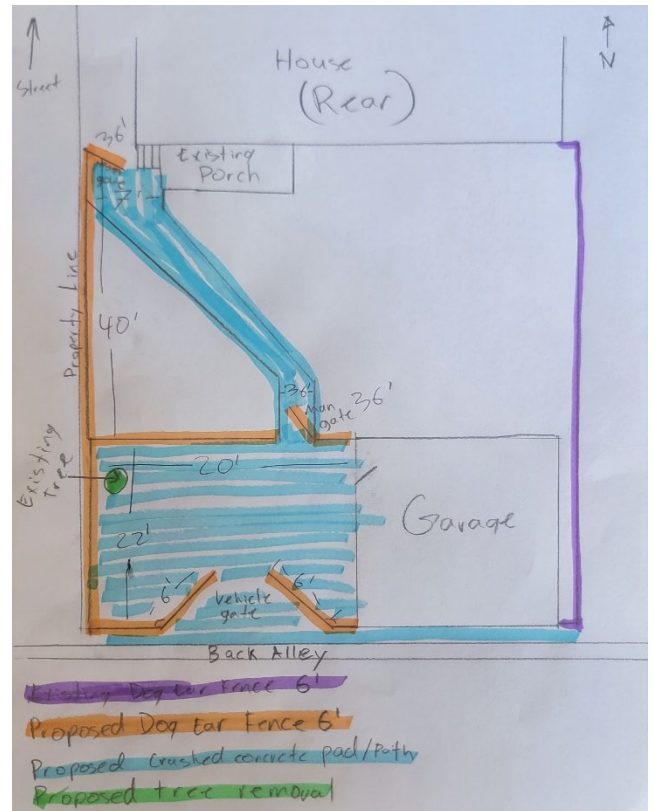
, by Applicant: Proposed installation of the gravel pad and walkway, fence, and tree removal.
